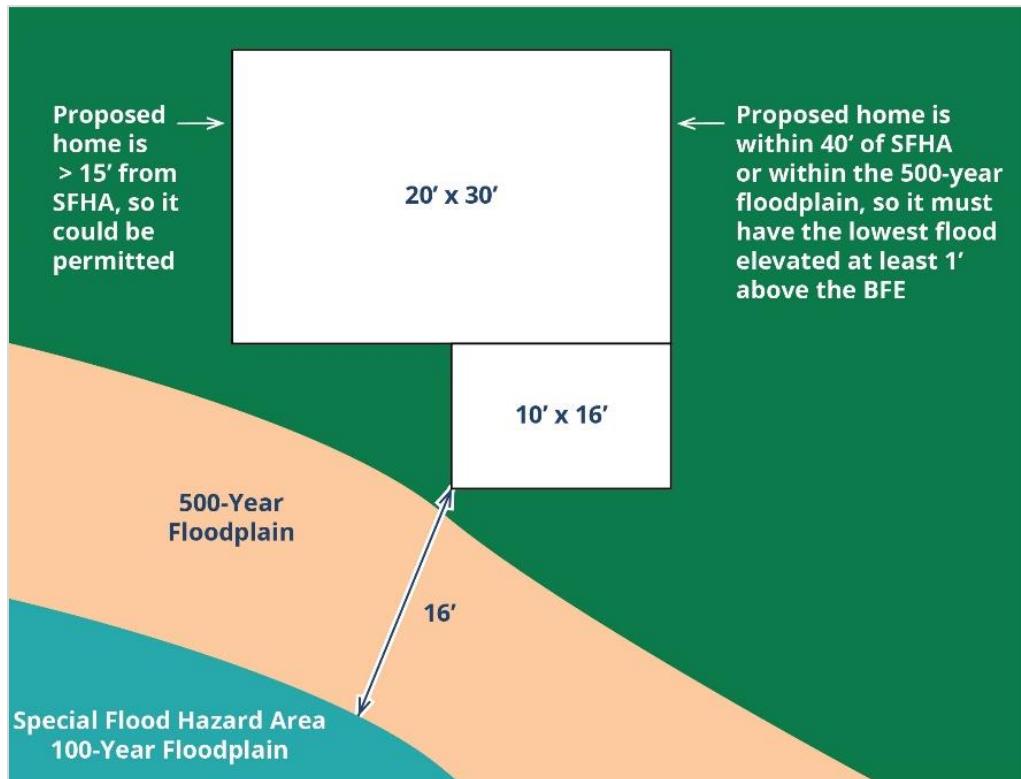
Example site plan with floodplain setback drawn to the nearest structure corner.
